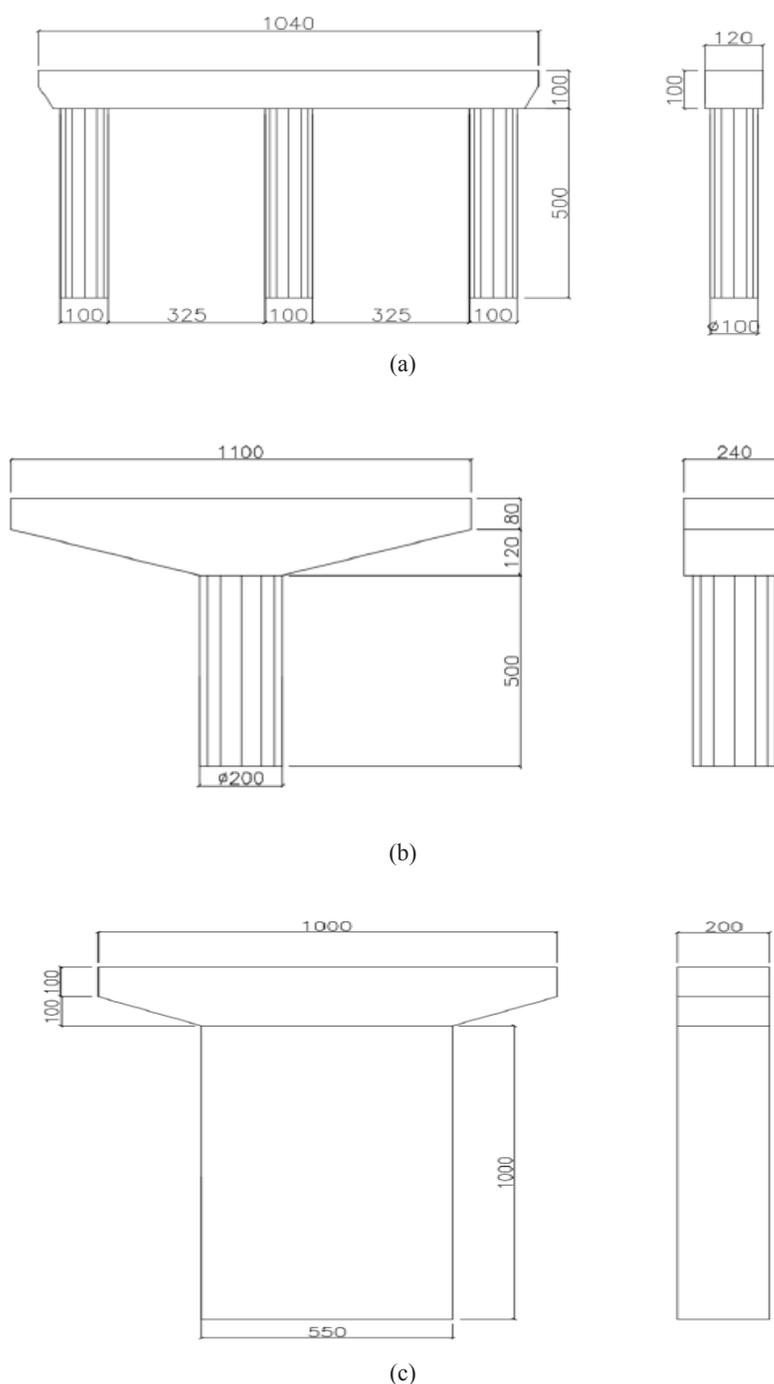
The selected bridge piers: (a). for bridge 1, (b). for bridge 2, (c). for bridge 3 (Pettorruso & Quaglini 2024).
